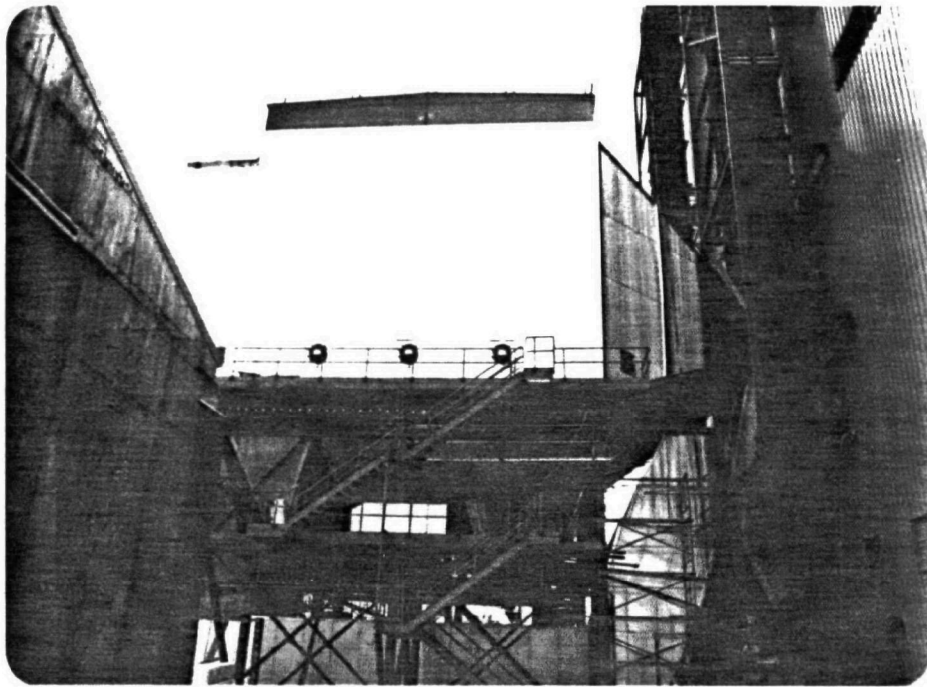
View from ground level facing west showing the ESP for Boiler 8.
